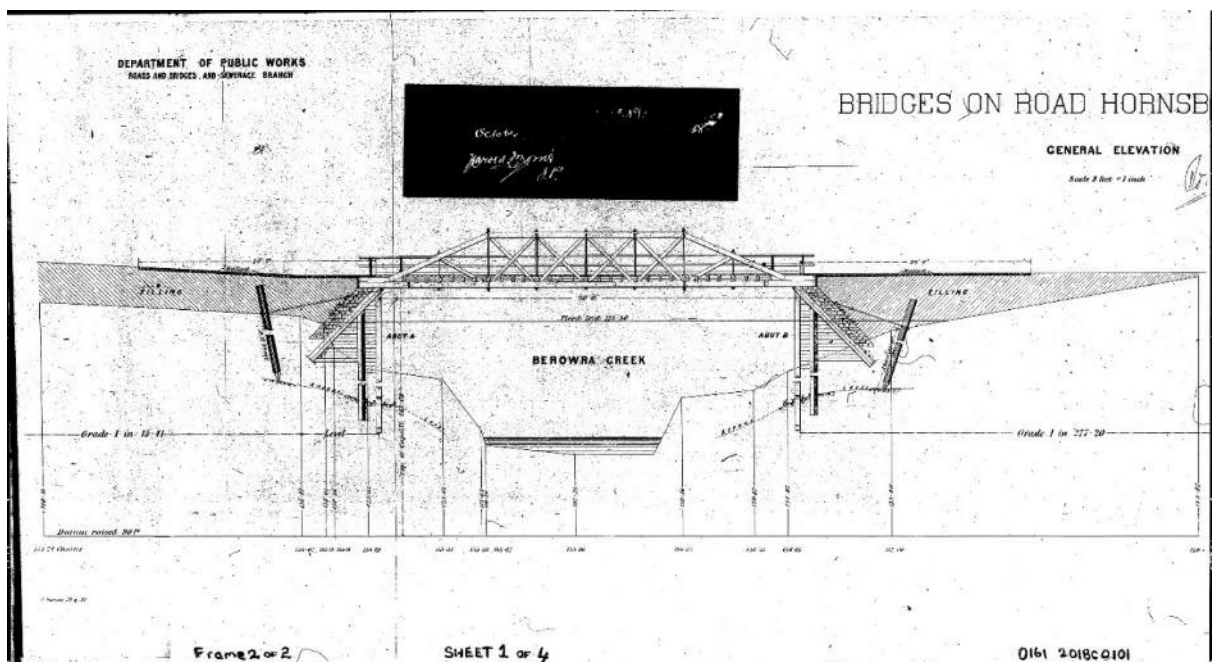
Elevation of the former bridge over Berowra Creek. (Source: Bridges on Road Hornsby to Galston, Department of Public Works, Roads and Bridges and Sewerage Branch, c.1892. RTA 161.201.BC.0101)
